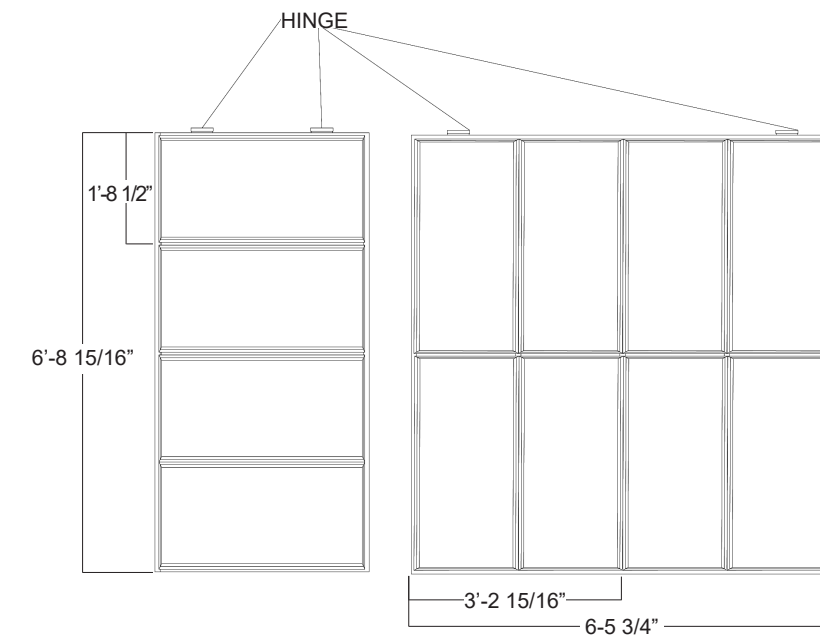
Door module (3.5' x 7') and (7' x 7') top hinge elevation
